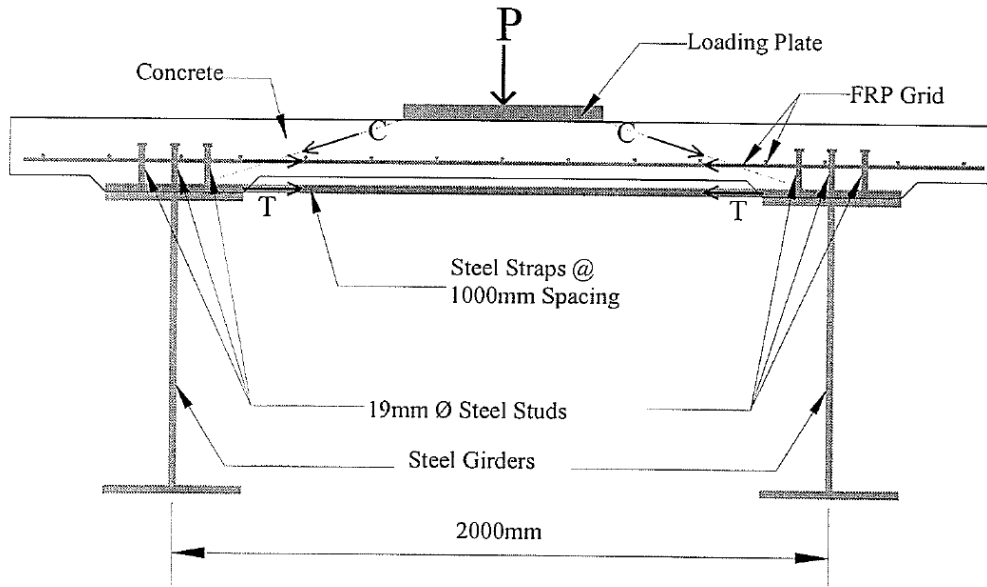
Second-generation steel-free bridge decks (Memon, 2005)
